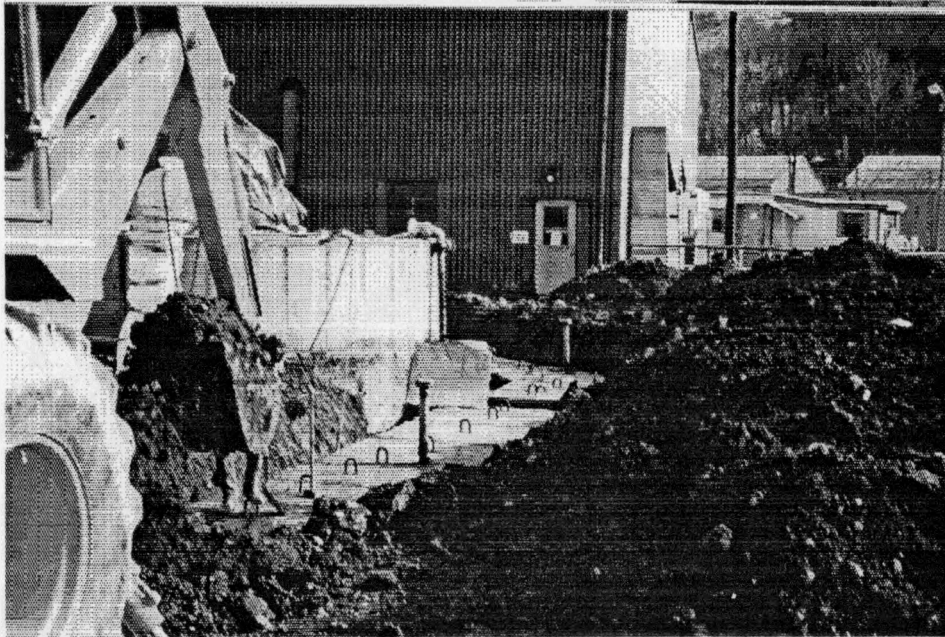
Excavation of a pipe trench in the East Yard area (106/31).
